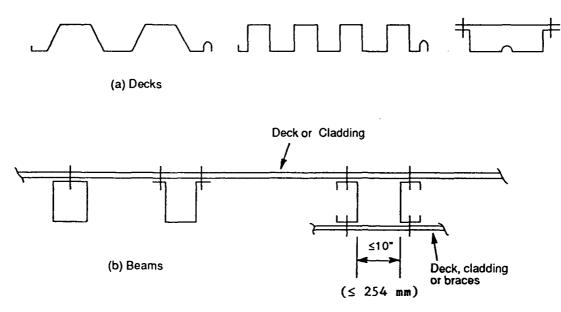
Sections Used for One Exception Clause of Section 3.3.5
